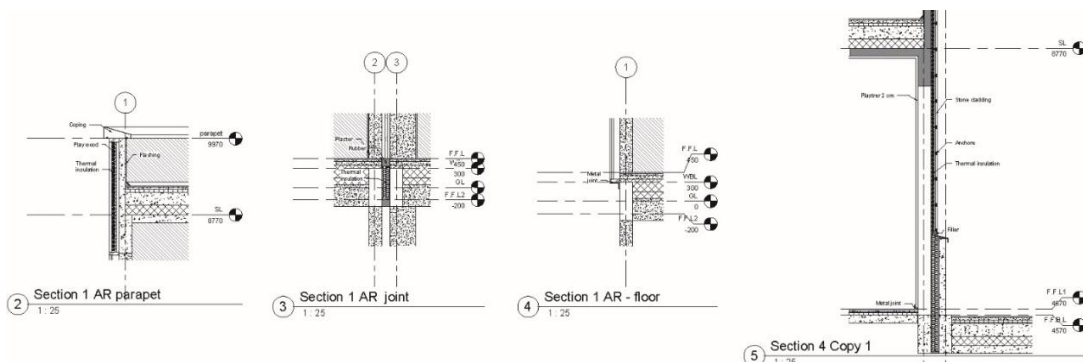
Building Components, UAEU, BIM Detailing Samples
